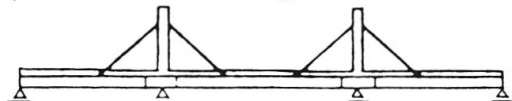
Erection of YAMATO Bridge (Cable-Stayed-Type Continuous Composite Girders)
